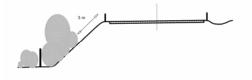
Cross section of the road on an embankment with presented width of mowing.
